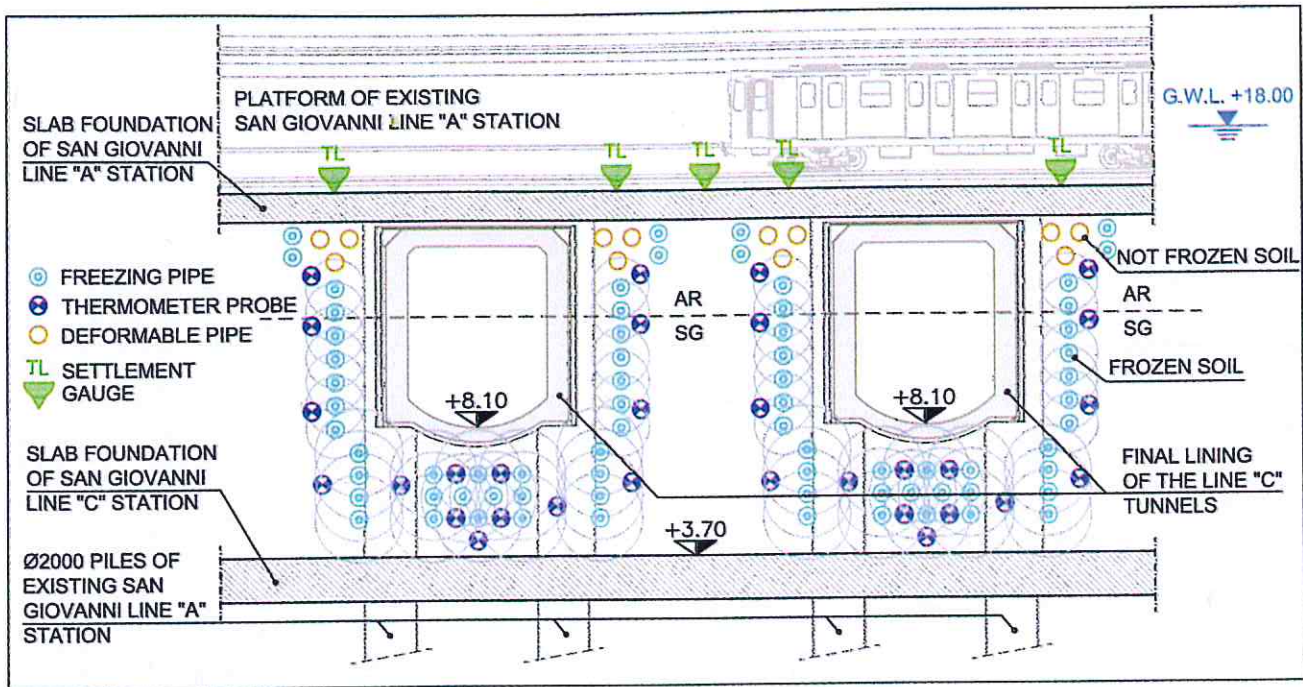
Cross section of the Line C tunnel underpassing the existing Line A station.
